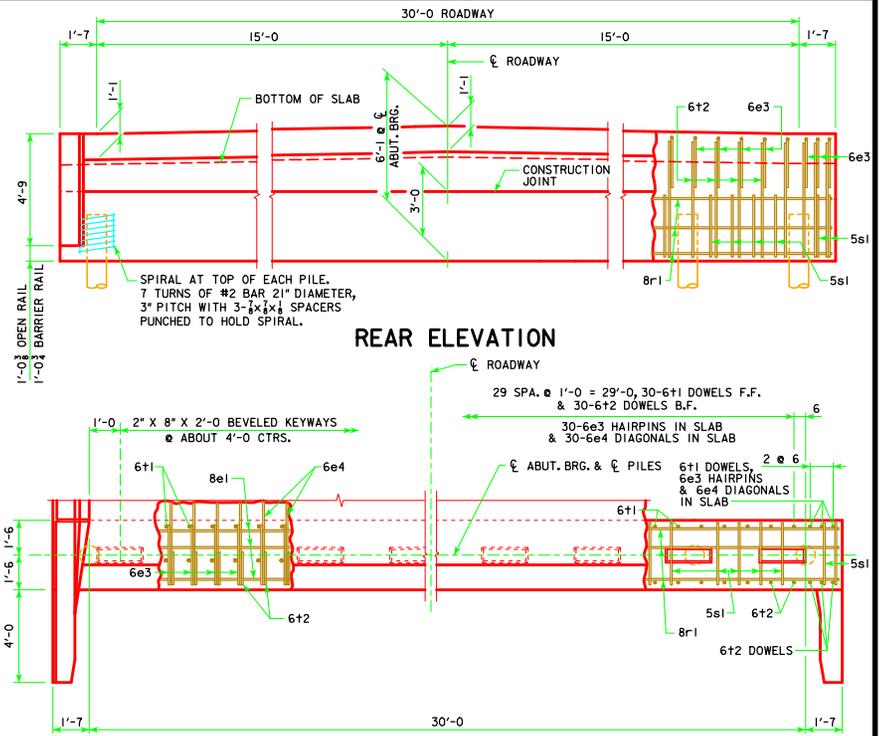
DETAILS ON THIS SHEET ARE TO BE USED ONLY WHEN ABUTMENTS ARE PLACED ON TIMBER PILES.
